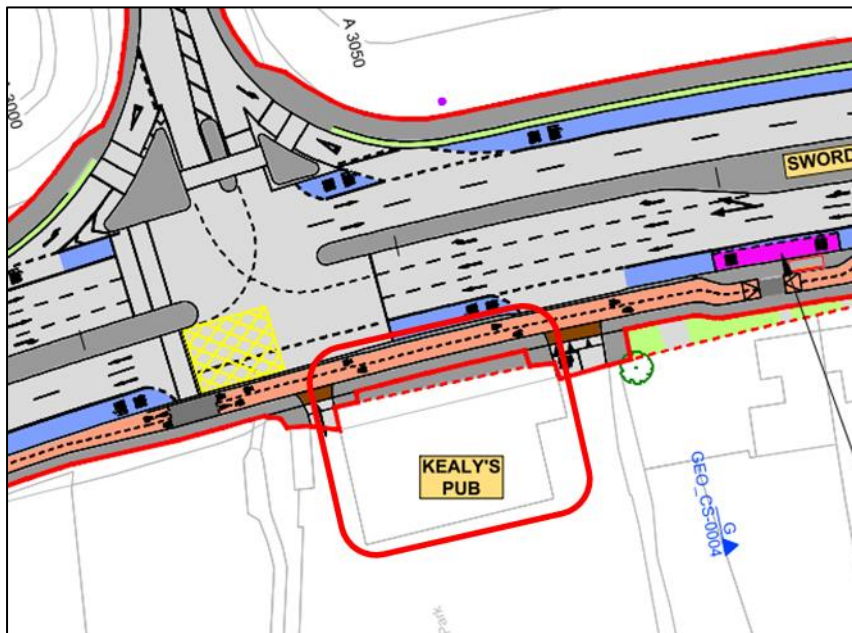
Proposed new Layout on the Swords Road (R132)
